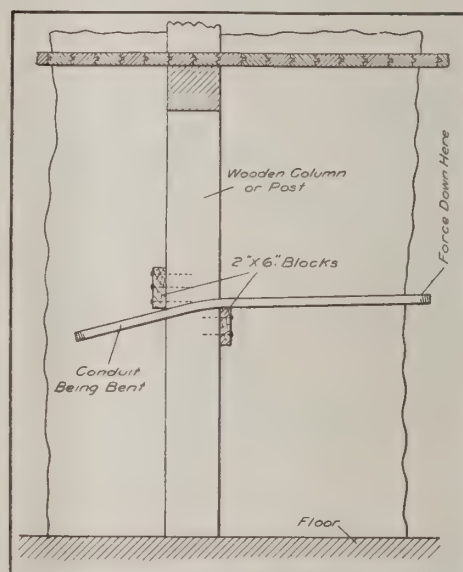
BENDERS MADE BY NAILING TWO BLOCKS ON A COLUMN.
